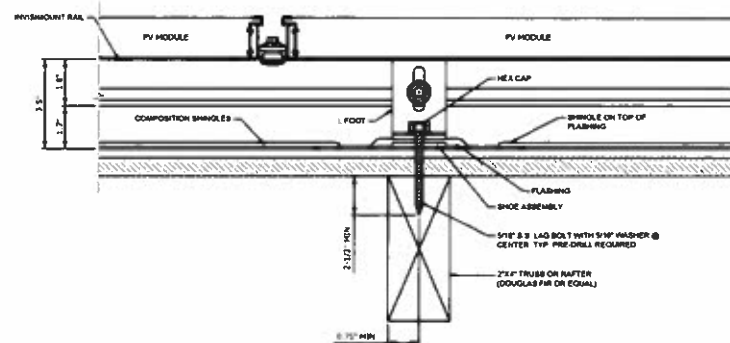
ROOF 2 STRUCTURAL FRAMING DETAIL
